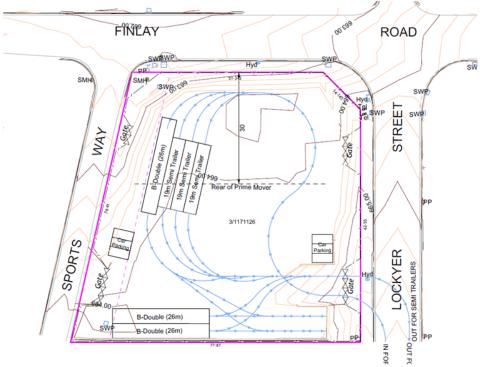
Parking Plan to Avoid Reversing at Night Time (not to scale, source: Laterals Planning Pty Ltd, plan no. 20007, dated 26/08/2020)
